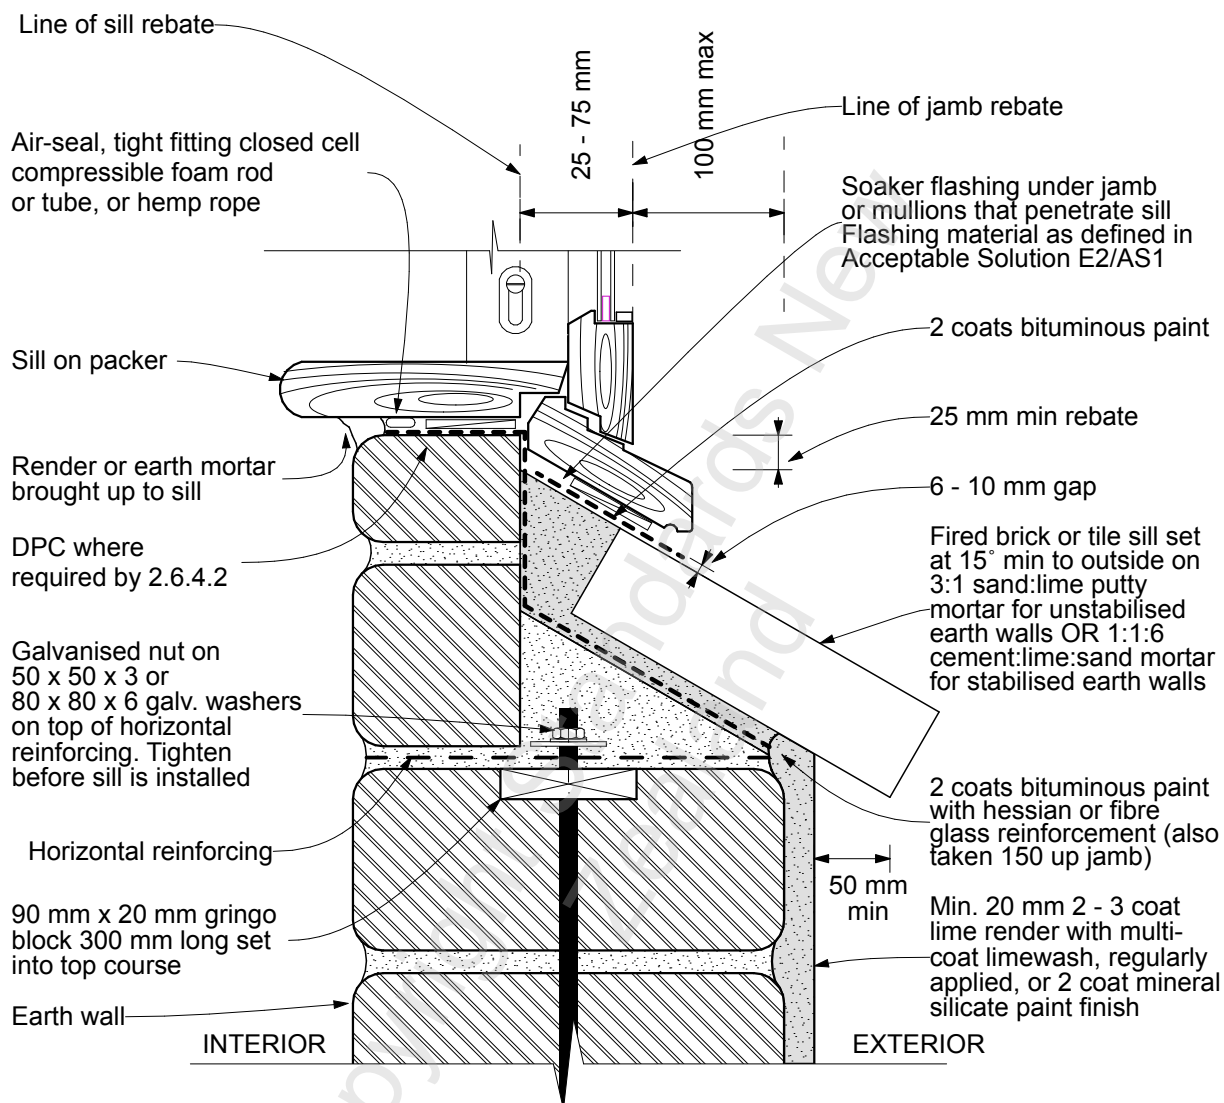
Timber joinery sill for lime plaster over solid earth wall
